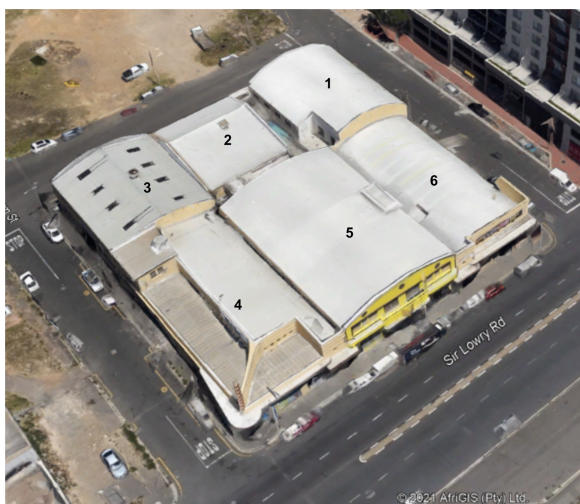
alongside shows the roofs of the buildings that comprise the site. Four of the roofs (numbered 1, 3, 5 and 6) are curved, with roof 2 a double-pitched roof and roof 1 a combination roof, comprising a monopitched roof behind the ground floor parapet wall, a flat roof on the Sir Lowry and Reform Road edges and a monopitched roof on the second storey portion. There is a shared service yard, accessed off Selkirk Street between buildings 1 and 2.
